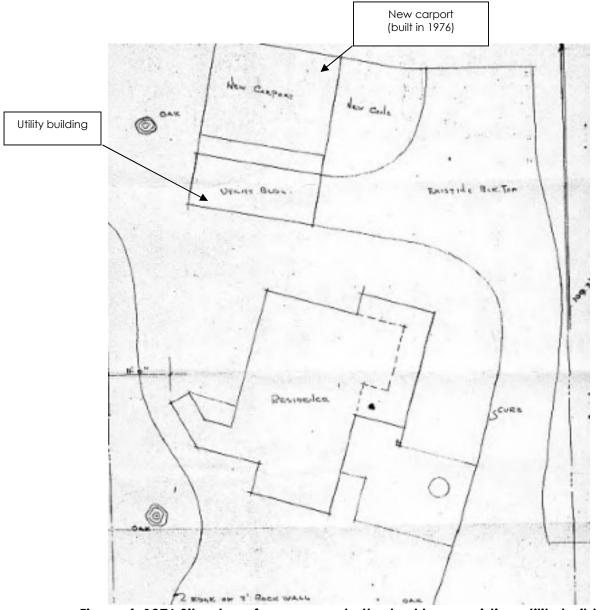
, 1976 Site plan of new carport attached to an existing utility building
